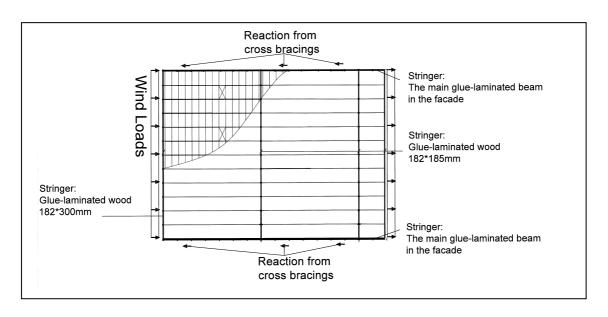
Plan: Roof diaphragm with wind loads in the longitudinal direction
